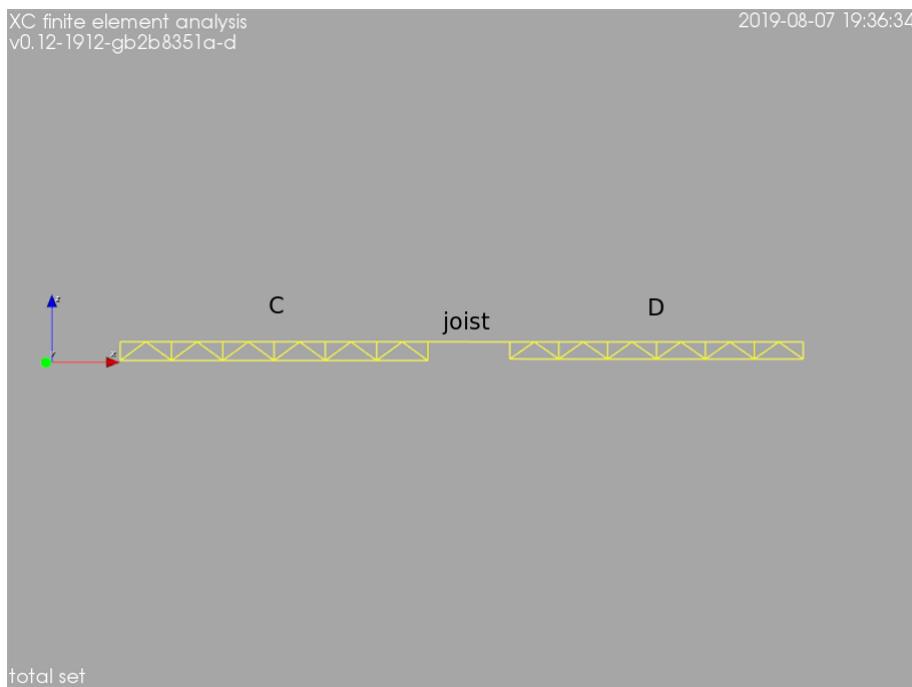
Floor trusses at zones C and D (see key plan in figure 1).
